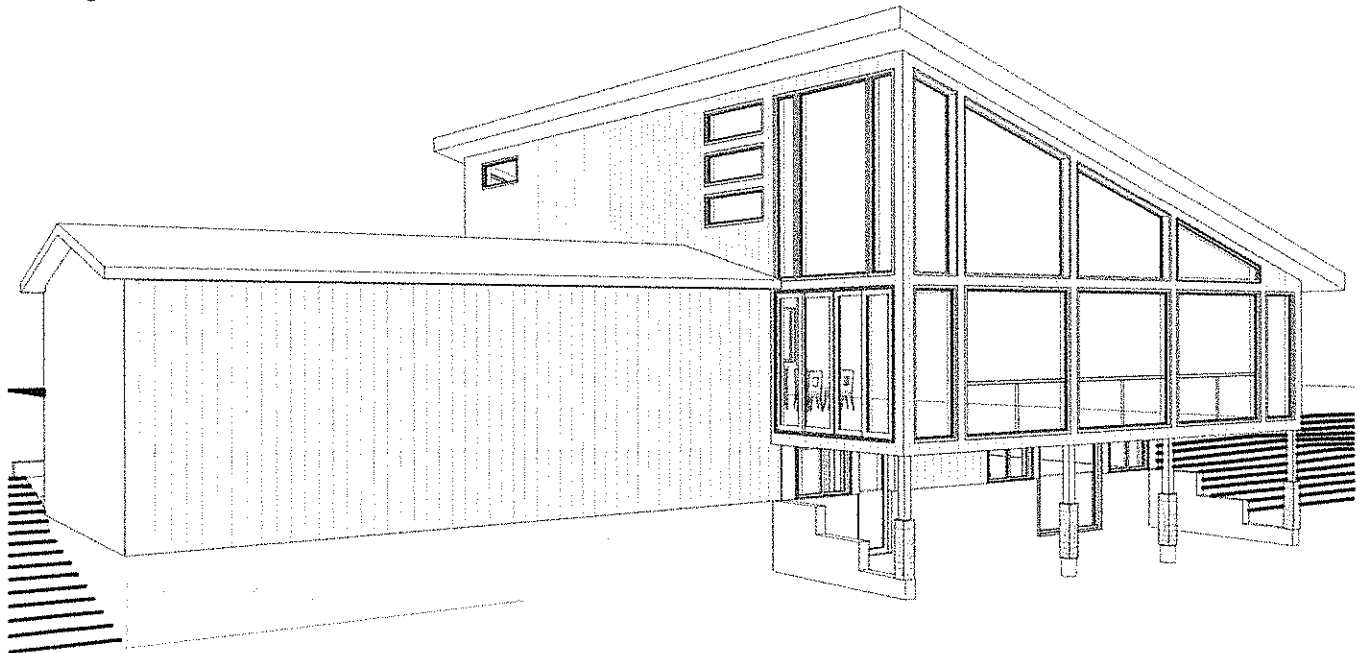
Rendering of proposed new addition prepared by Evolution Design & Drafting
